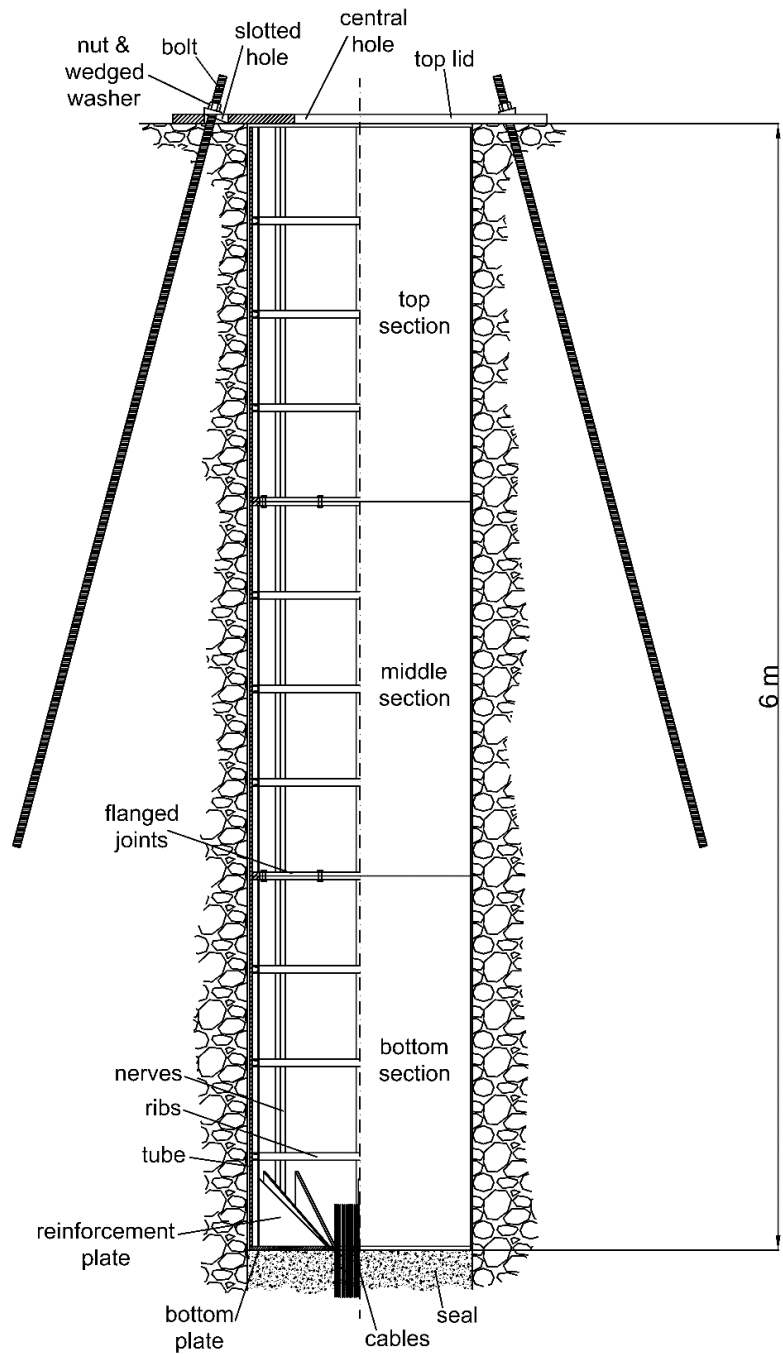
Longitudinal section of the metal plug in Shaft 1
